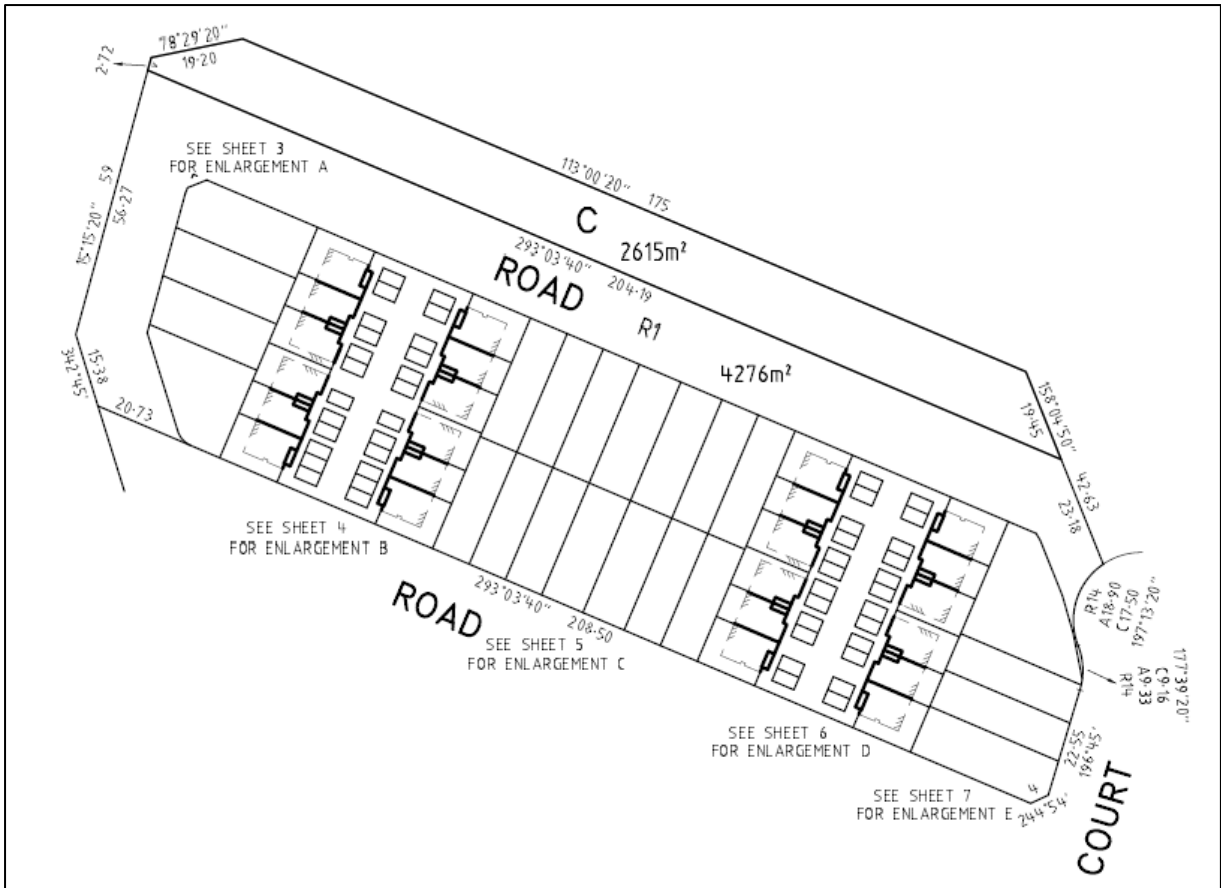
(above): Extract from the S3 subdivision plan shown new road extension and the 2,615 sq/m balance lot. Source: Application documents.
